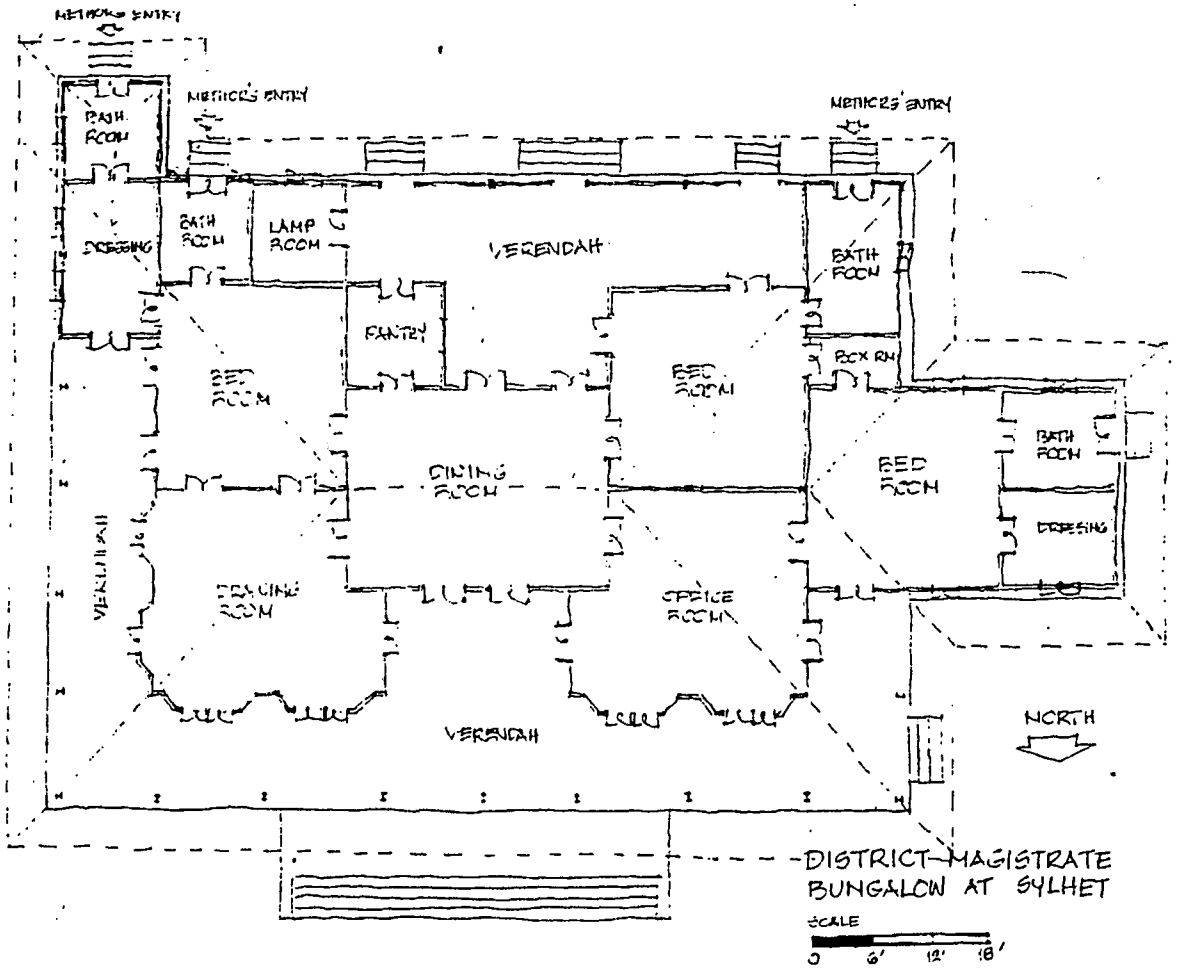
Ground floor plan, D.M. Bungalow, Sylhet
